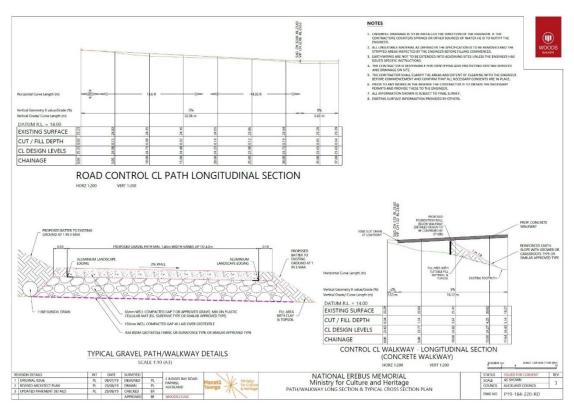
National Erebus Memorial – Path/Walkway Long Section & Typical Cross Section Plan (Woods 2019)
